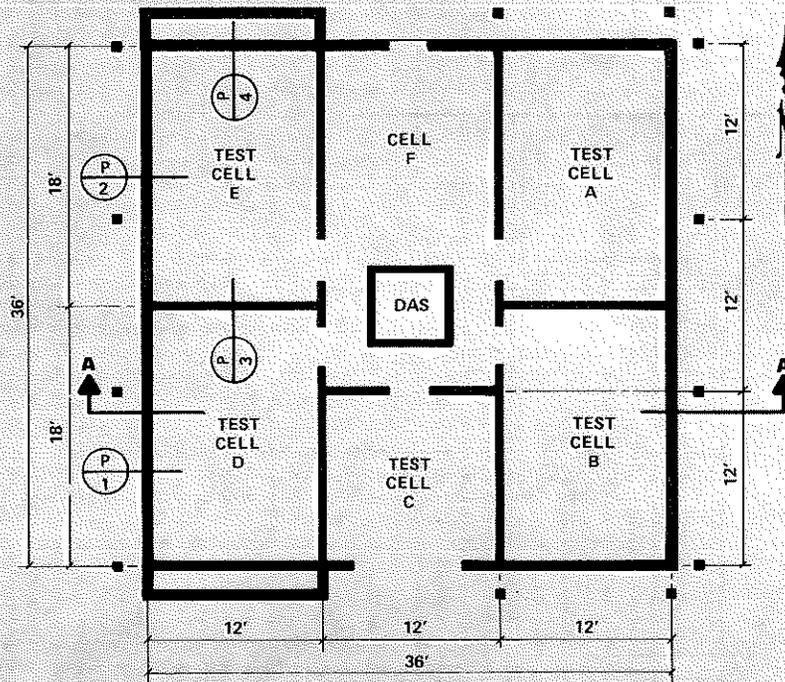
Plan view of FSEC passive cooling lab as configured for wall tests in cells D and E
